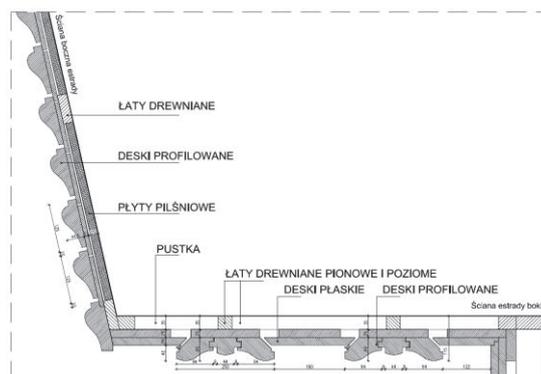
A cross-section of profiled wood panels and wave-shaped panels covering the bottom part of the hall's side walls
